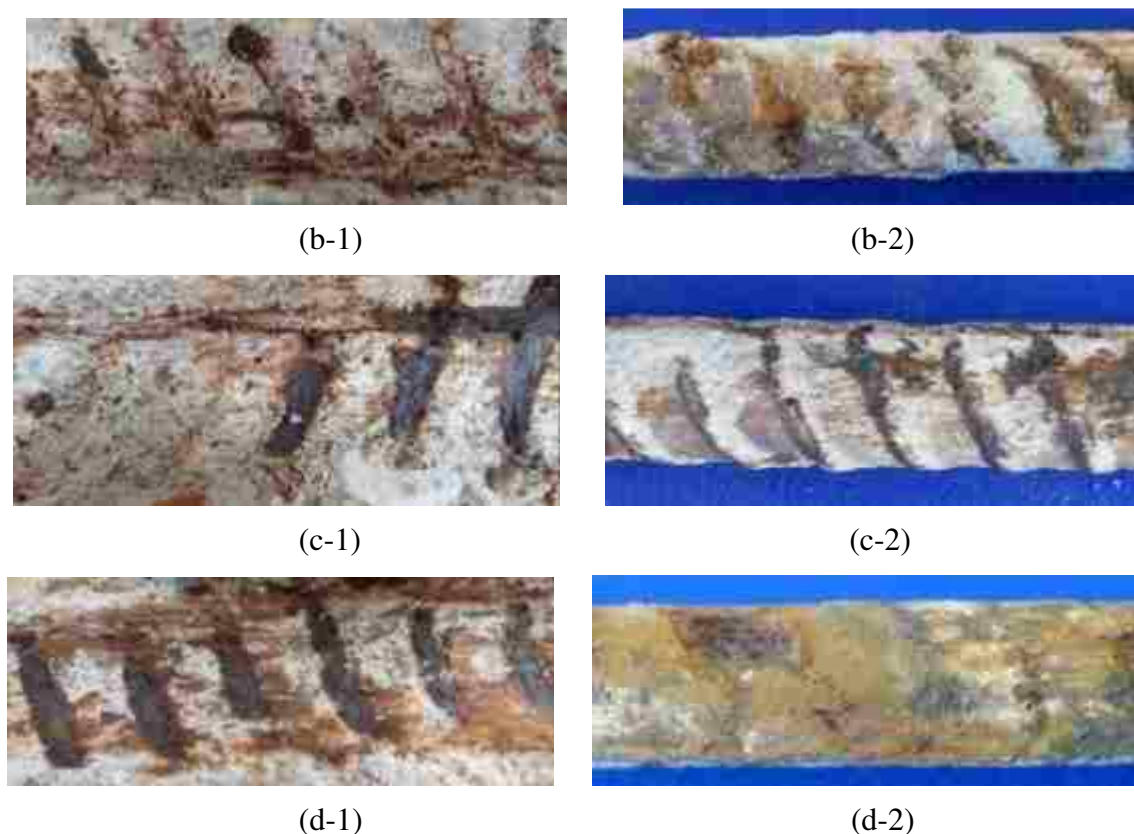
Visual observations on steel-concrete interfaces after pullout tests: (1) concrete interface, (2) steel bar surface; (a) uncorroded specimen, (b) slightly corroded specimen on ribs, (c) slightly corroded specimen on lugs, and (d) severely corroded specimen. (cont.)
